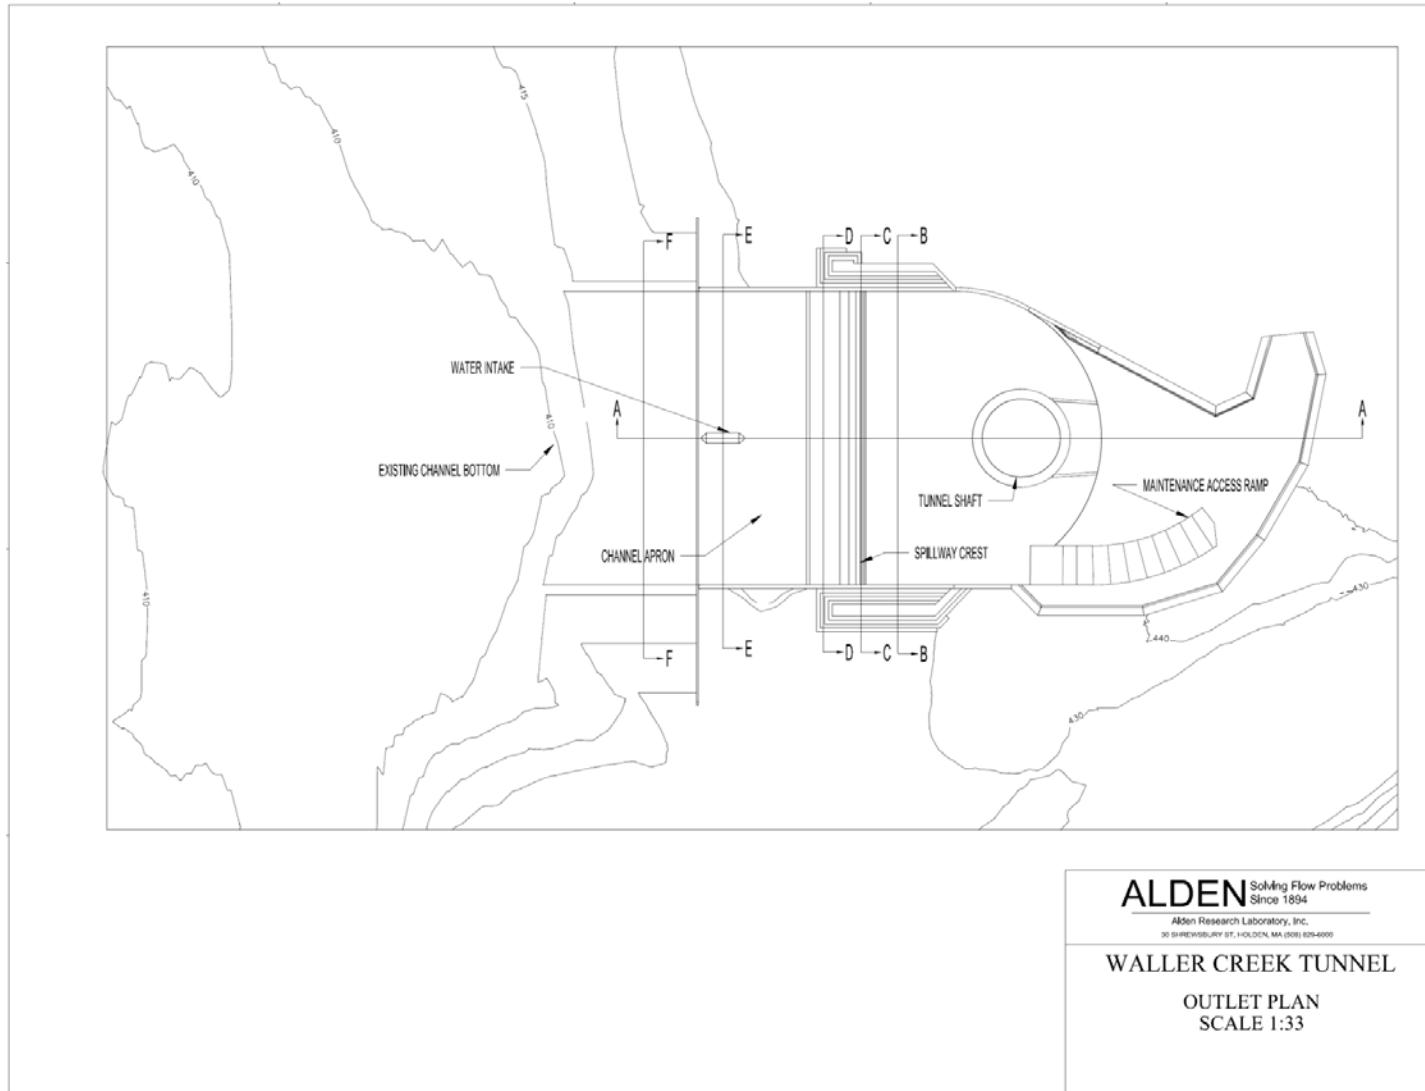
Waller Creek Tunnel Project; 1:33 Scale Model Outlet Plan
